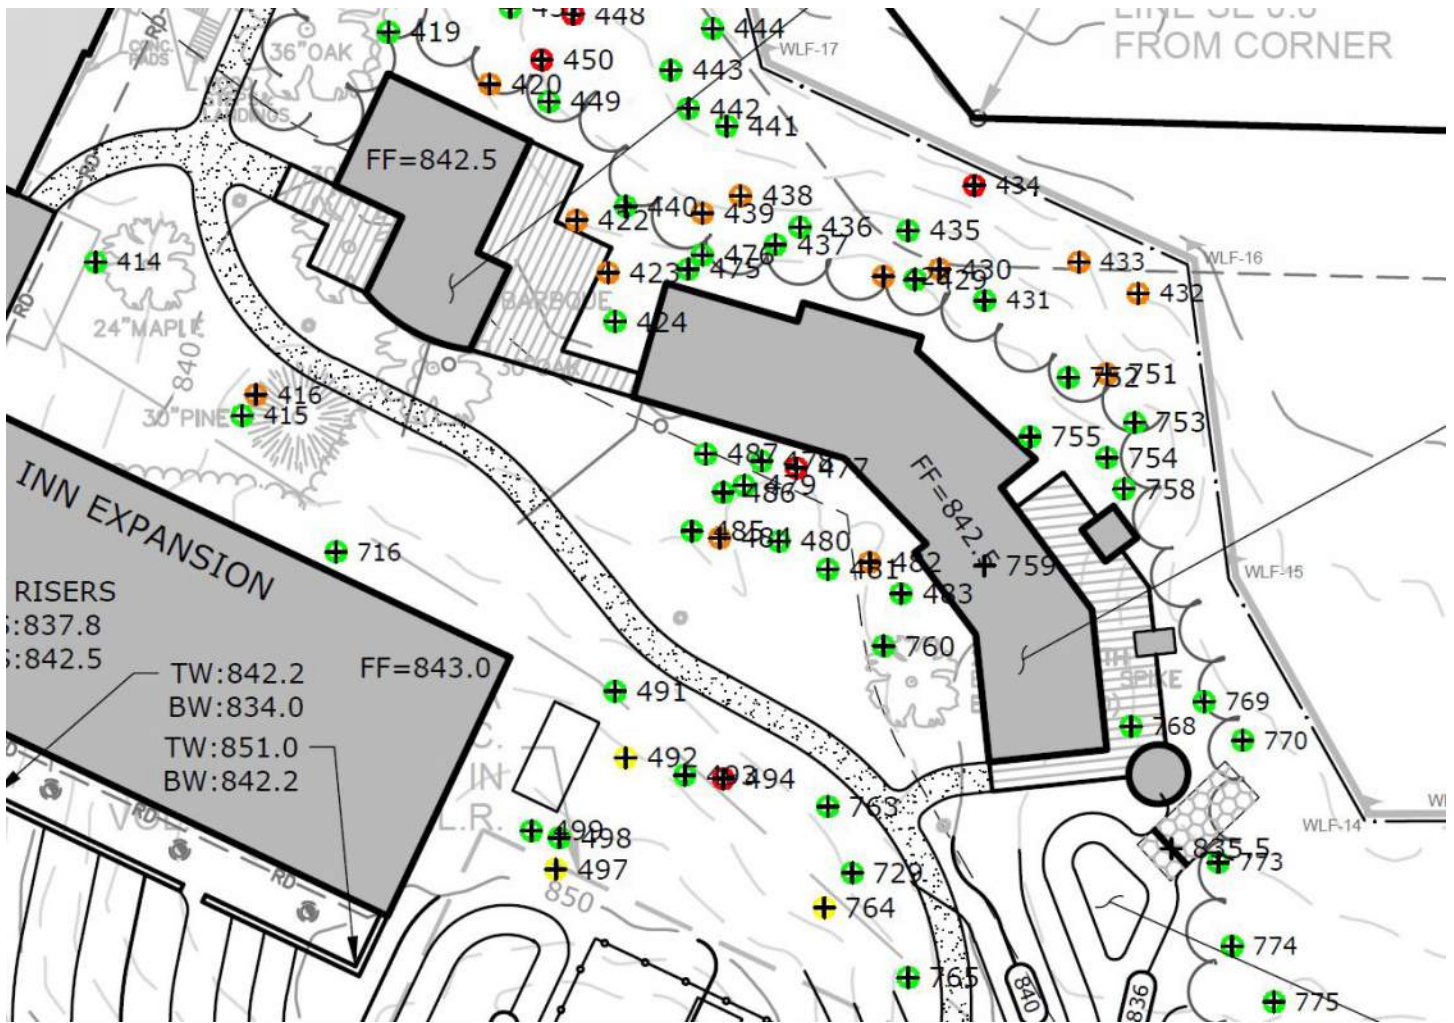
of area surrounding West building. A deliberate access or mobilization plan will be required here to limit the disturbance to surrounding trees along with the installation of trunk protection where working in close proximity to remaining trees. As with the trees surrounding the cabins, care must be taken to limit root impacts with the installation of a fence at the limits of construction and to protect the soil from excessive compaction.
